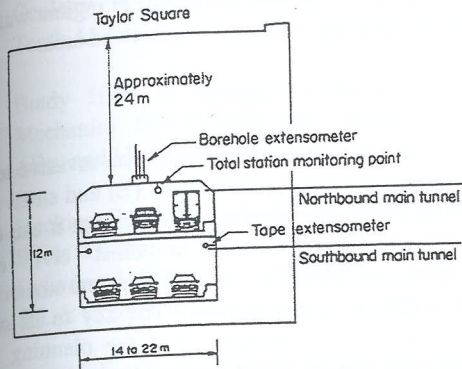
Typical Tunnel Cross Section with Monitoring Array
